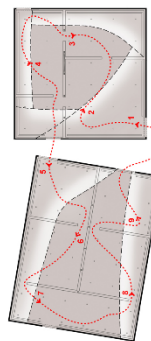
routing and light in the galleries (Steven Holl Architects)
